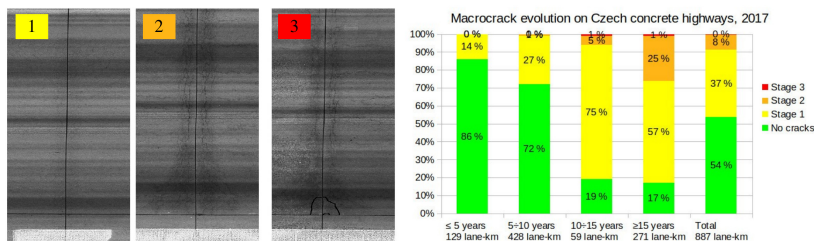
Deterioration of Czech concrete pavements built after 1990 [8].
